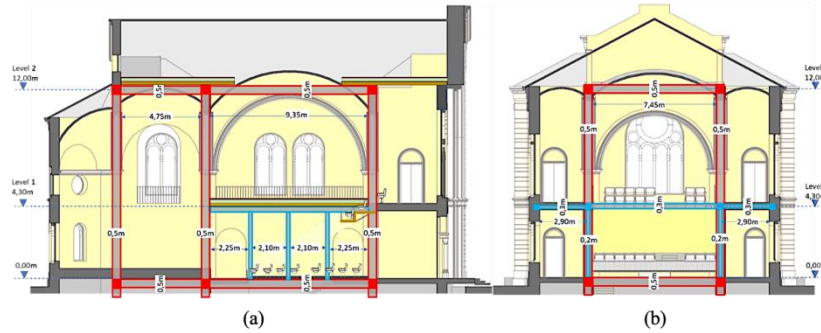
Concept of retrofitted and added structural elements: longitudinal (East-West) (a) and lateral (South-North)(b) cross-section of building.
